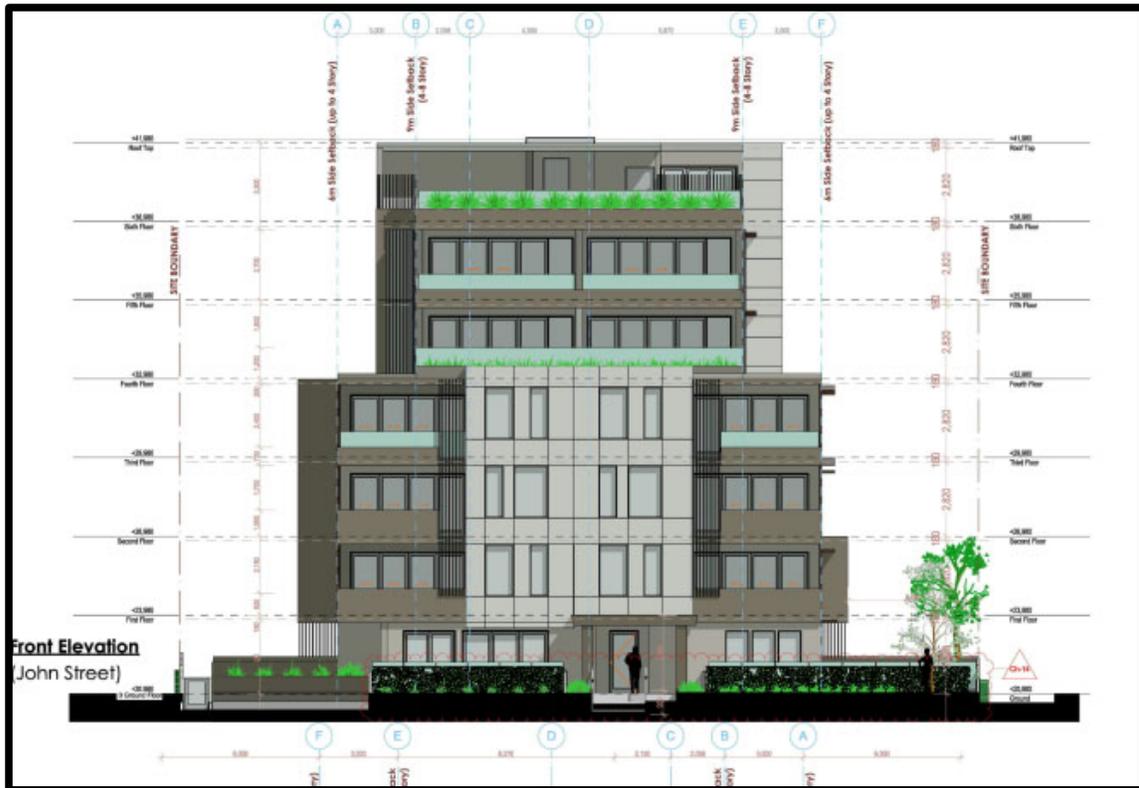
Front elevation of approved 1-3 John Street, Kogarah Bay DA2017/0218 (Source: Tecton Group).
